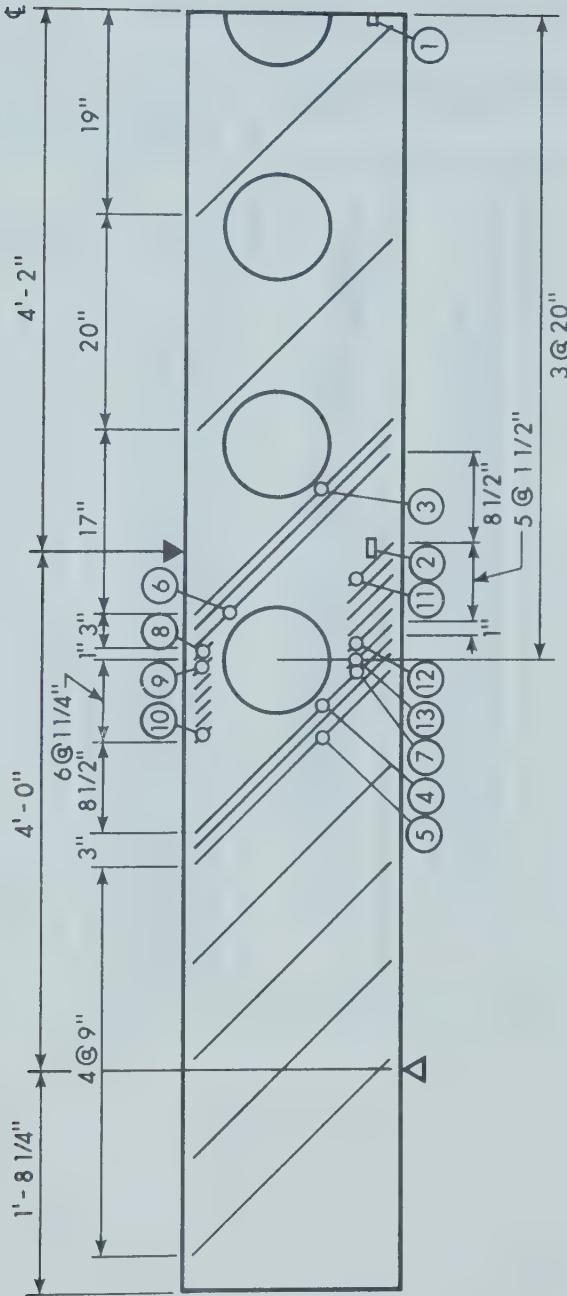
BEAM AD-6 REINFORCEMENT AND GAUGE DETAILS
